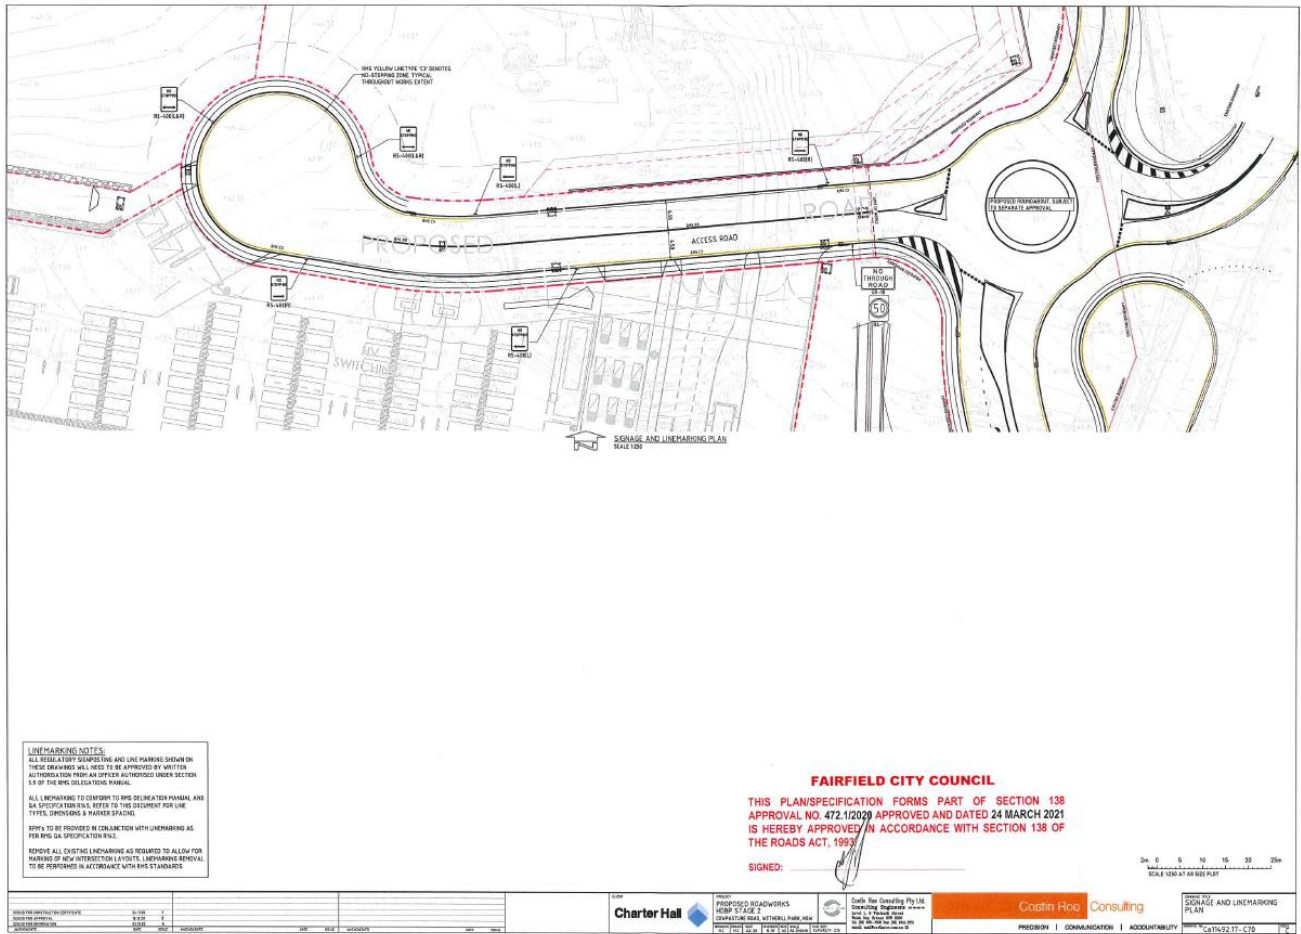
Estate Road Stamped Plans – Section 138 Approval.
